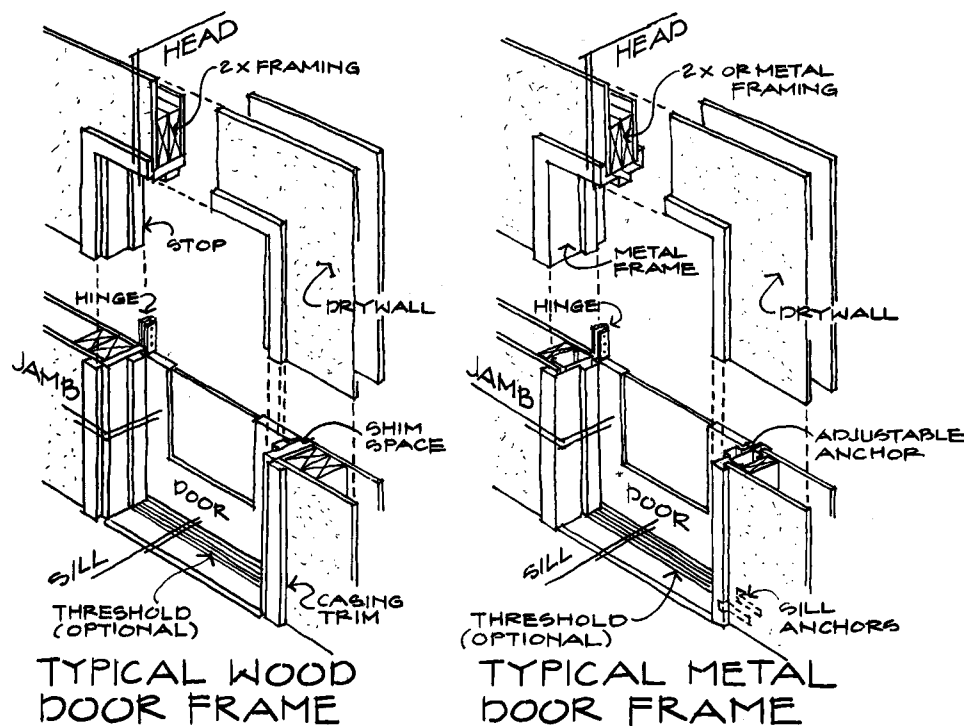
Door frames are made in wood or metal and have a variety of construction features and terminology.
